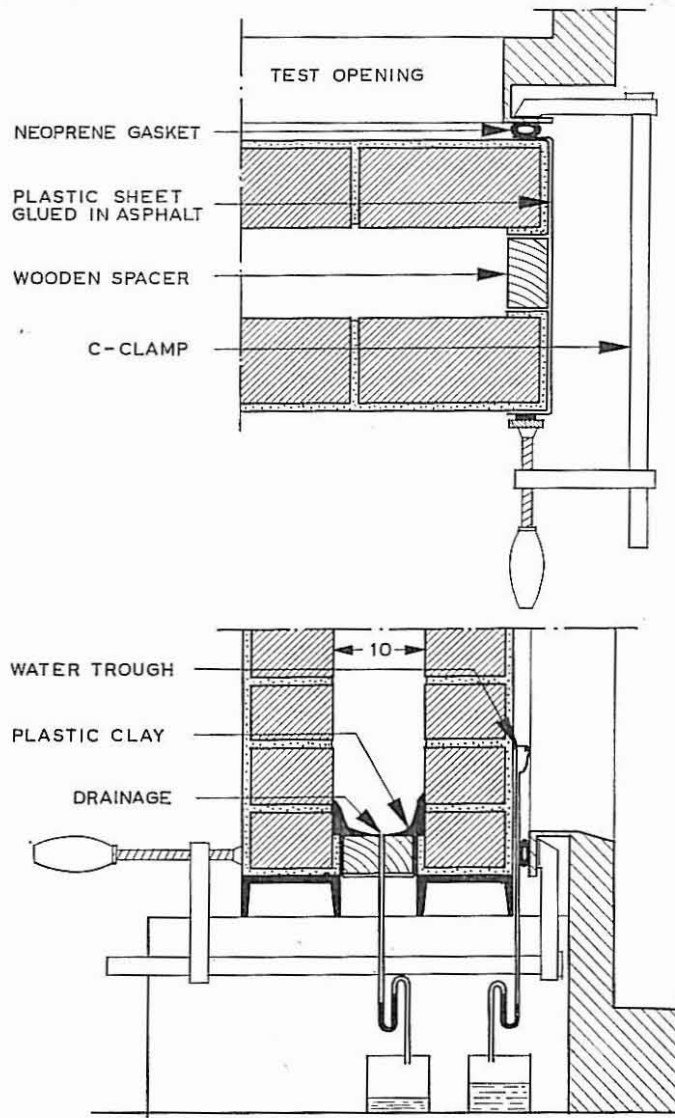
Details of Test Panel for Cavity Wall Test.
